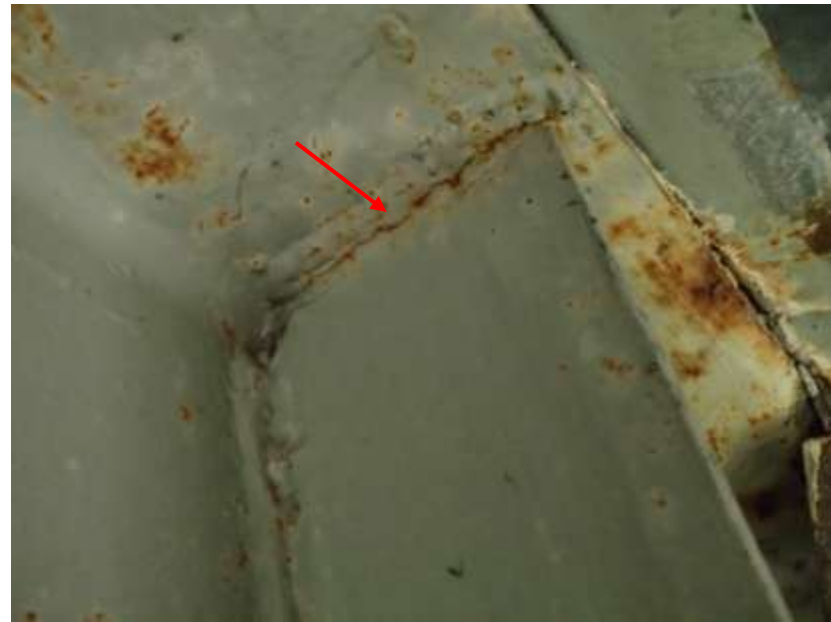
General view of the cracked weld between the top flange and the connection plate in Span B, near Pier 2, on the east side of G1.
